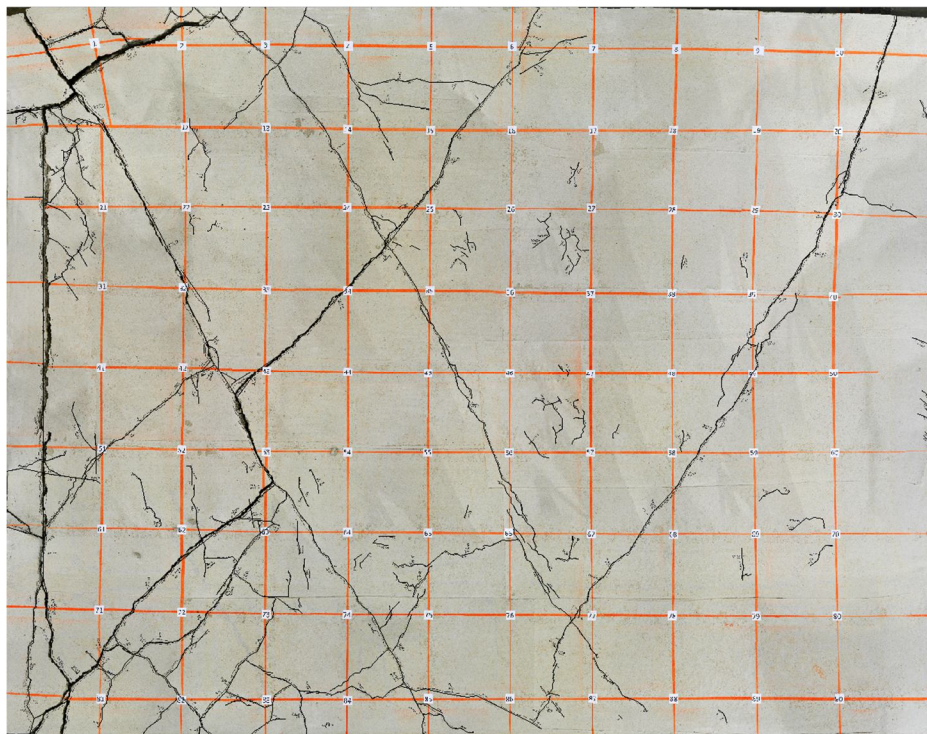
Crack Distribution of Specimen 3/7.5-4-N-NF-DT Further Cracking After Strength Decrease (Point E in Figure 3-13)
